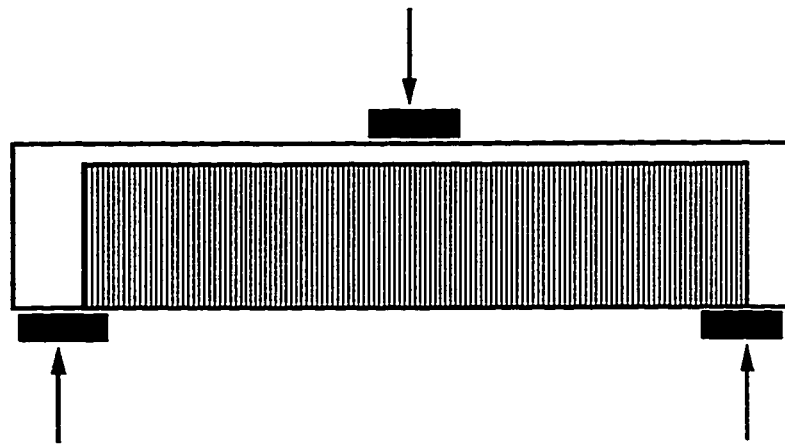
Vertical Shear Enhancing CFRP Sheets
